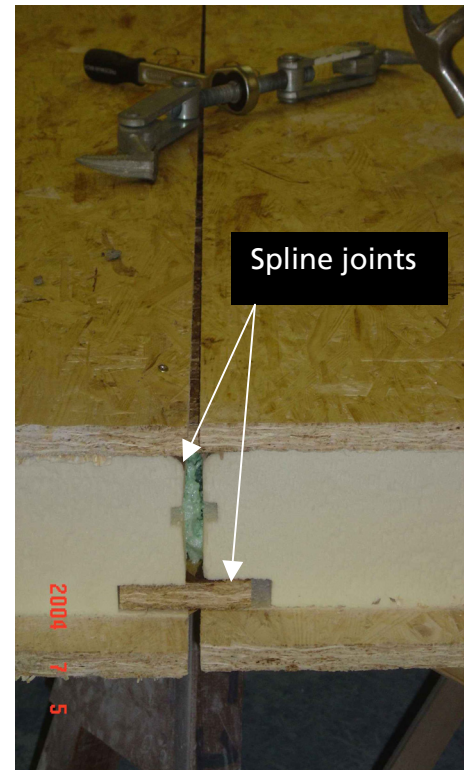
Spline detail showing expanding urethane foam before ratcheting panel together
